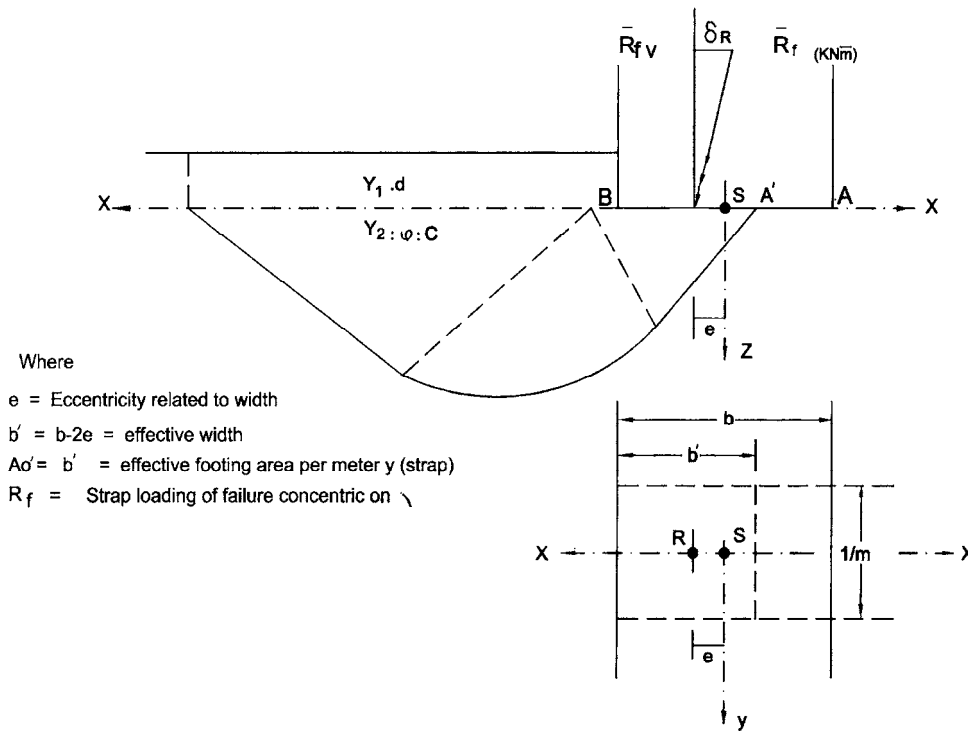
Horizontal surface - Eccentric, inclined strap loading
